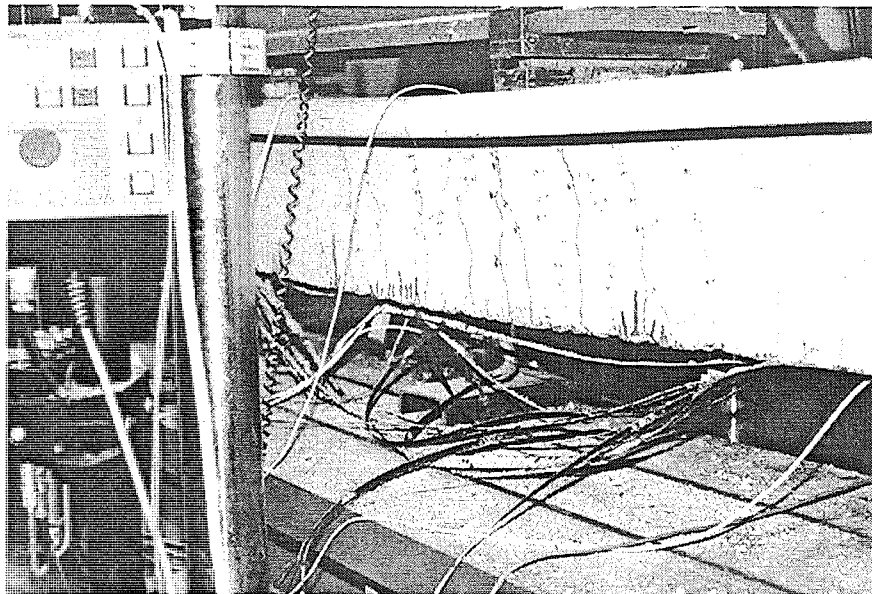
Tensile failure of CFRP sheet in Beam No. 2
